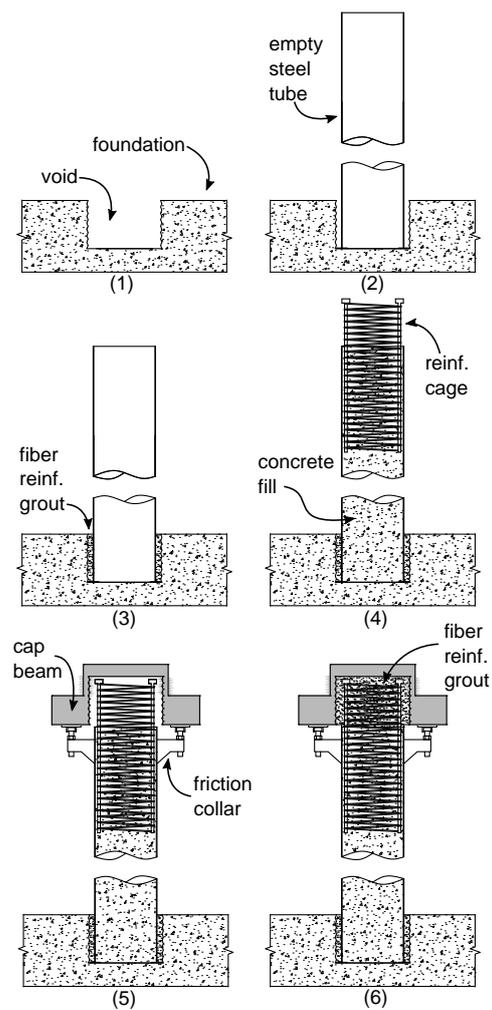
C Reinforced Concrete Construction Sequence
